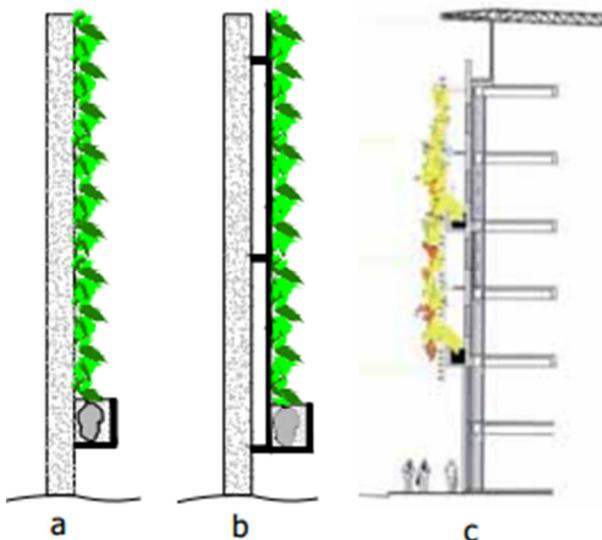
a) Showing planter box at the bottom with plants directly on the wall, b) planter box at the bottom with plants on supporting structure, c) planter box at the bottom of floors with plants of supporting structure (Mir, M. A. 2011).
